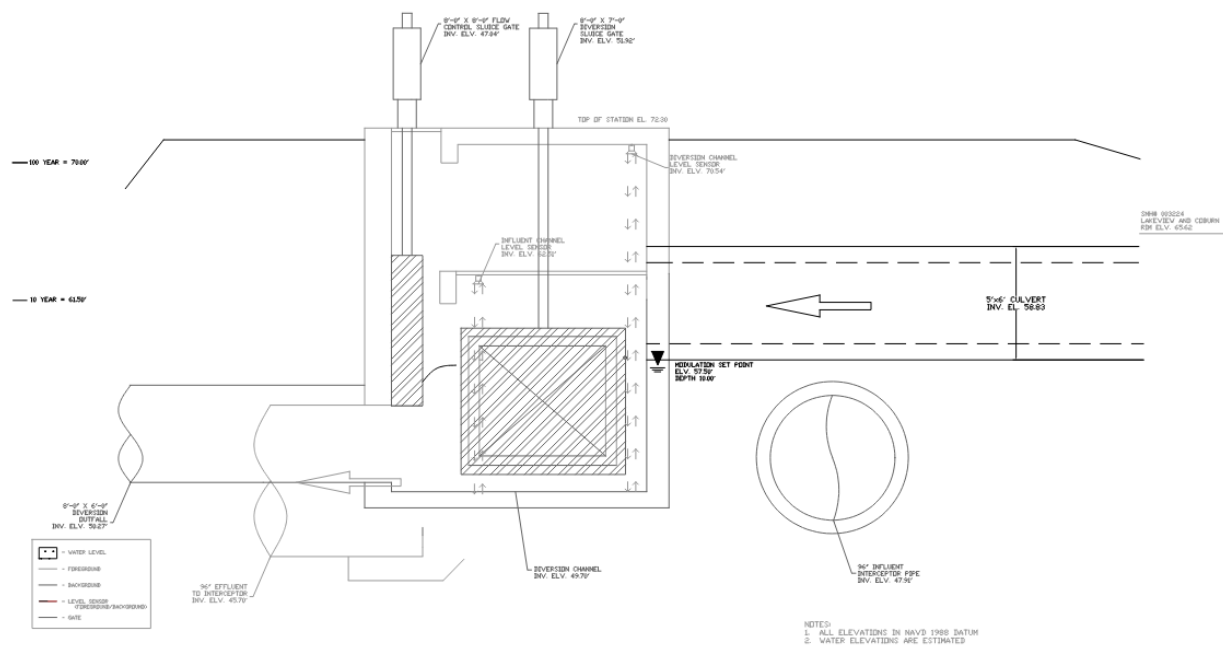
West Station Diversion Chamber Connection (South profile)
